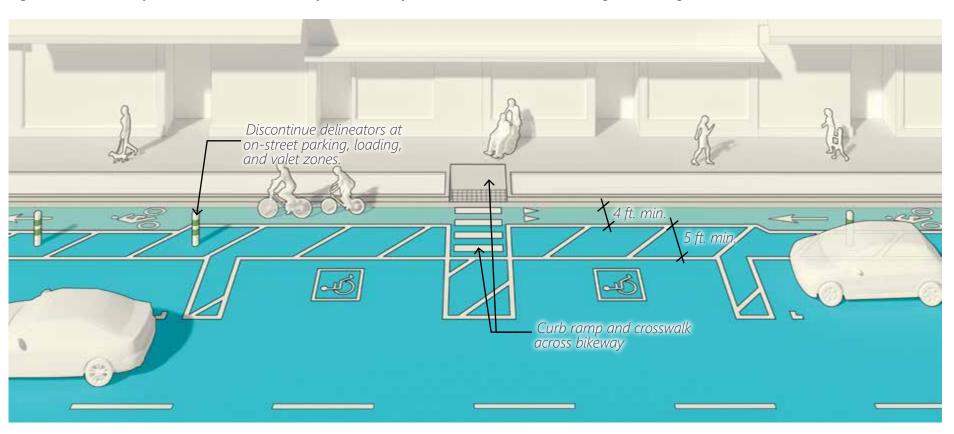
One-Way, In-Street, Class IV Bikeway, Protected by Bollards and On-Street Parking, at Accessible On-Street Parking.
